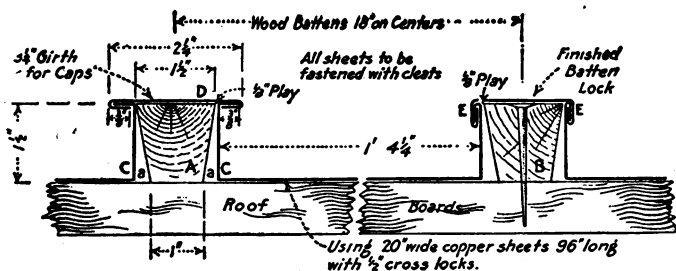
Sectional View of Batten Roofing with Full Size Measurements
